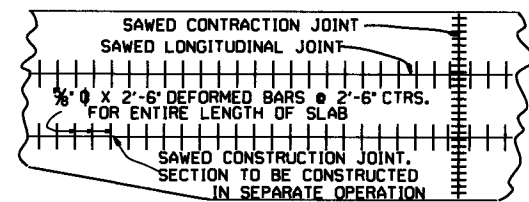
DETAIL OF SAWS LONGITUDINAL JOINT AND LONGITUDINAL CONSTRUCTION JOINT
